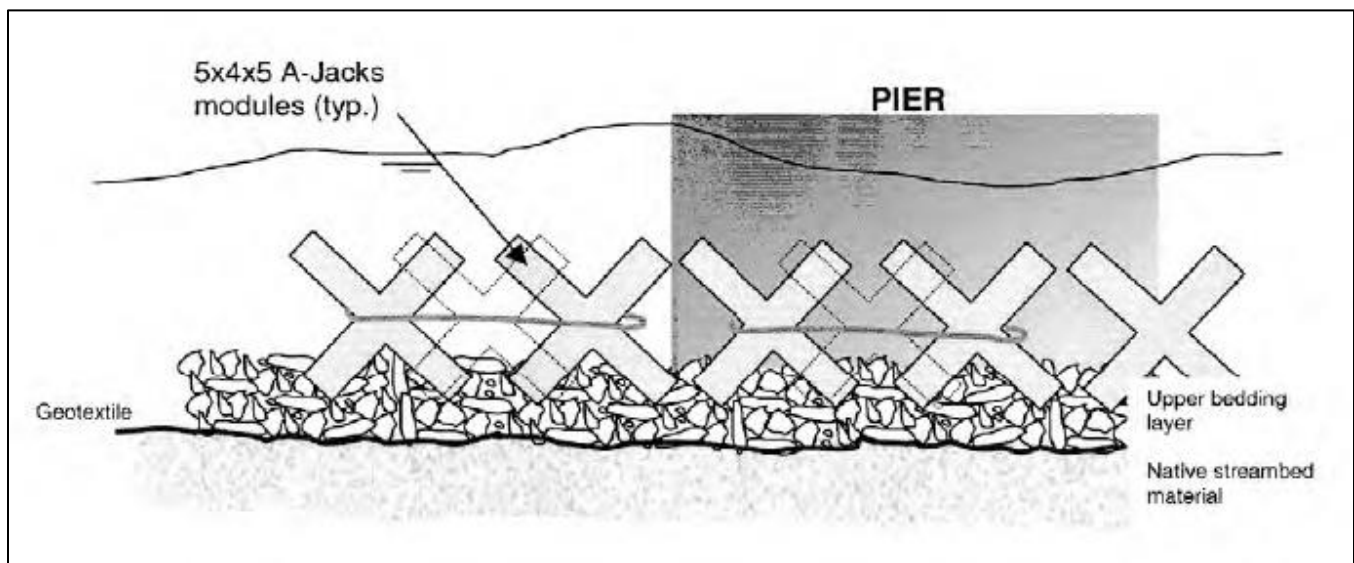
Detail of A-jacks® installed at a pier on a bedding layer of blast stone with geotextile (Lagasse *et al*, 2009 Vol. 2).
